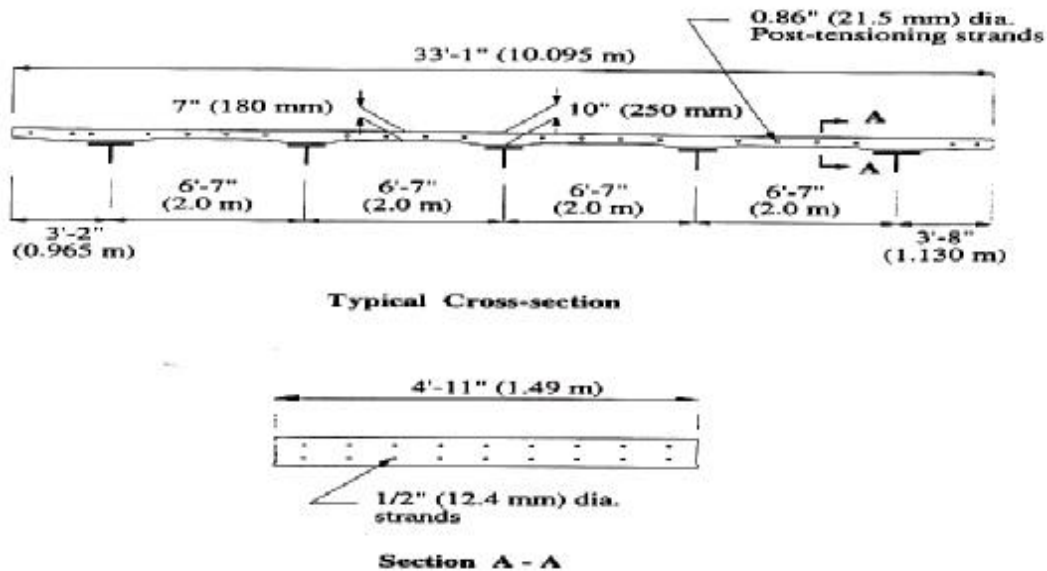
Typical precast prestressed concrete panel of the Shin-kotoni-kouka Bridge Suehiro Viaduct in Osaka, Japan
